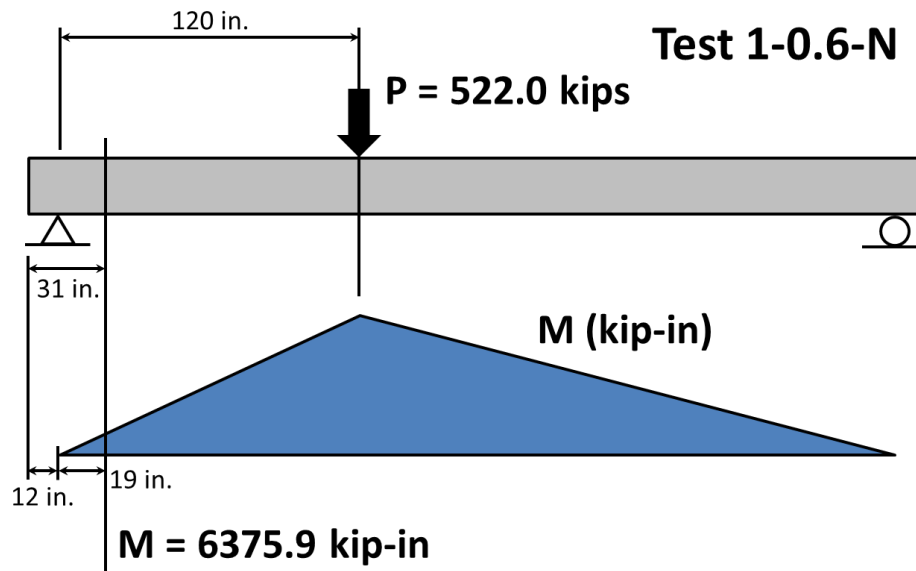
Moment at 31 in. for Expected Anchorage Failure (Test 1-0.6-N)
